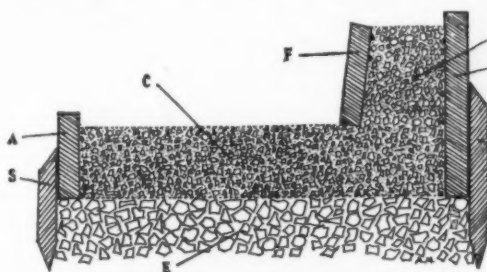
CONCRETE CURB AND CUTTER, SHOWING DRAINAGE FOUNDATION AND CONCRETE BASE. (TOP COAT NOT SHOWN)
